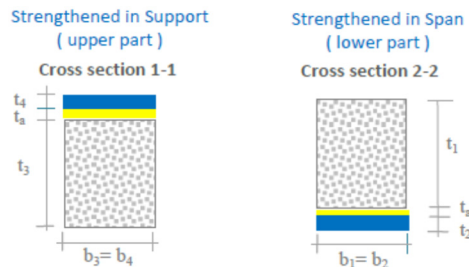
Continuous RC beam bonded by a prestressed composite plate: cross section in span and on both supports
